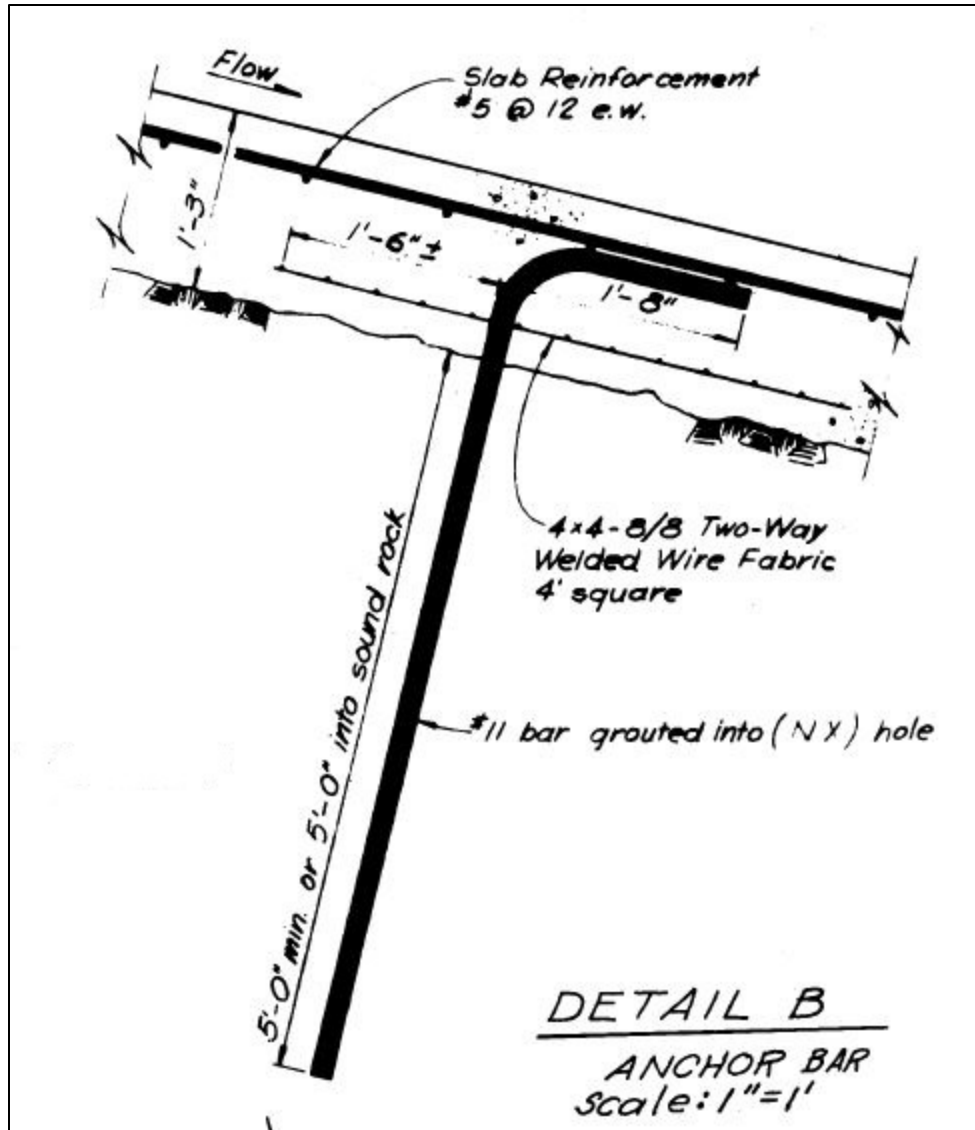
Anchor Bar Detail (from Drawing A-3B9-4)
